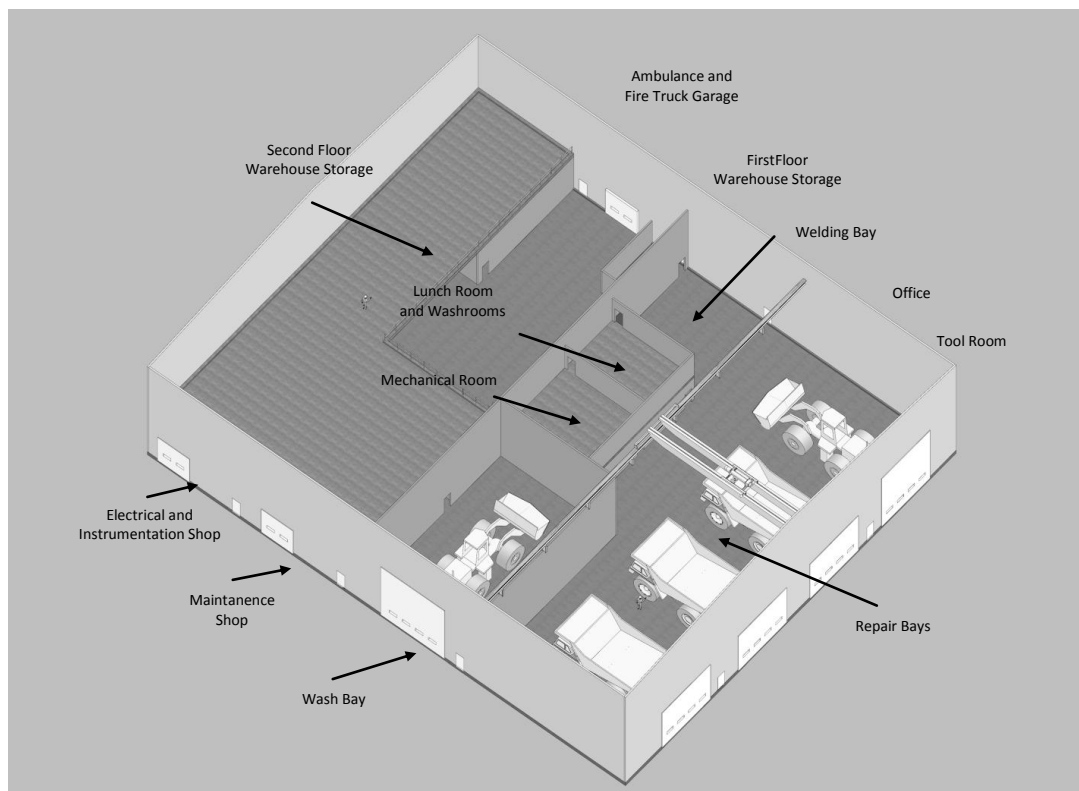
Isometric of the Preliminary Mine Service Complex Layout
